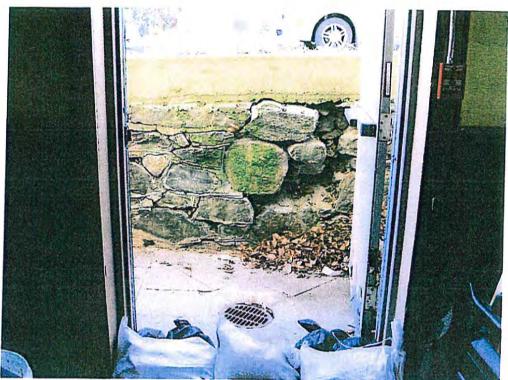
Boiler Room Outside door open and Broken Stone Wall
